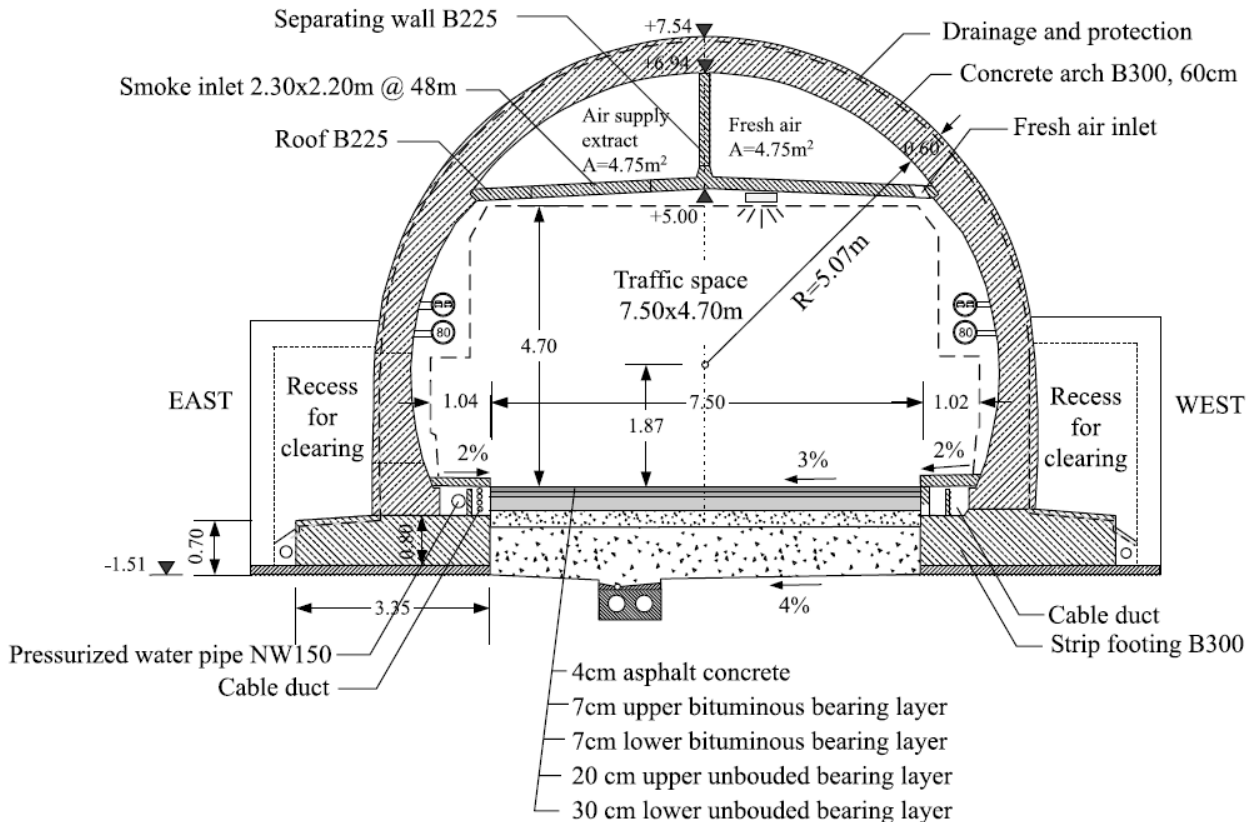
2 Typical Two-Lane Tunnel Cross section elements and Clearance Requirements [Source: Dimitrios Kolymbas; Tunneling and Tunnel Mechanics]
